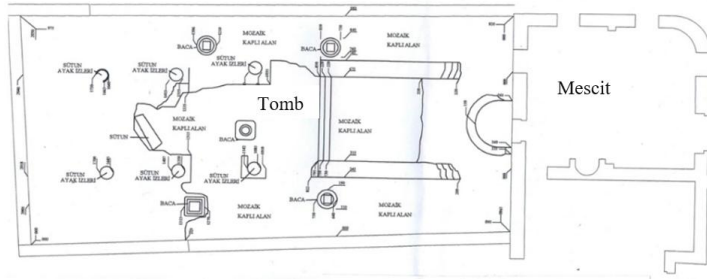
Roof plan sketch of Karklar tomb (Bağışkan, 2007)
